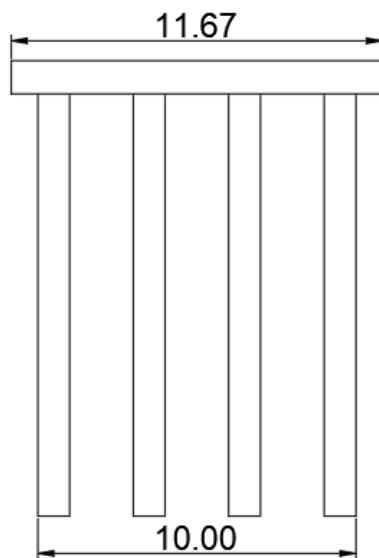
Detail of the spur bridge Pier 6 (embankment pier) on the left bank.
